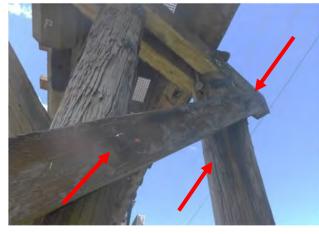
Pier 4 cross bracing bolts surface corrosion, vertical splitting in piers
